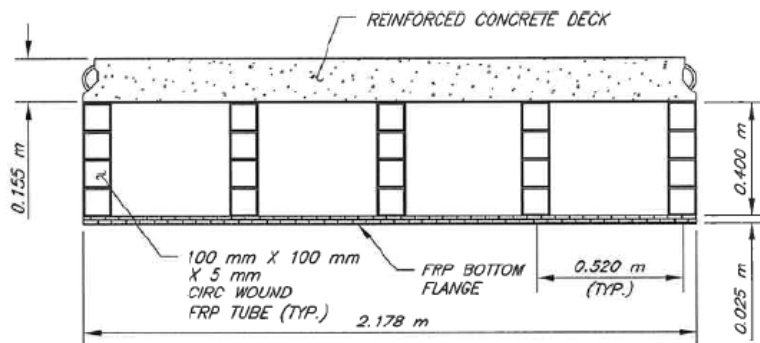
Oregon Road Bridge Section View (O'Connor, 2008)
